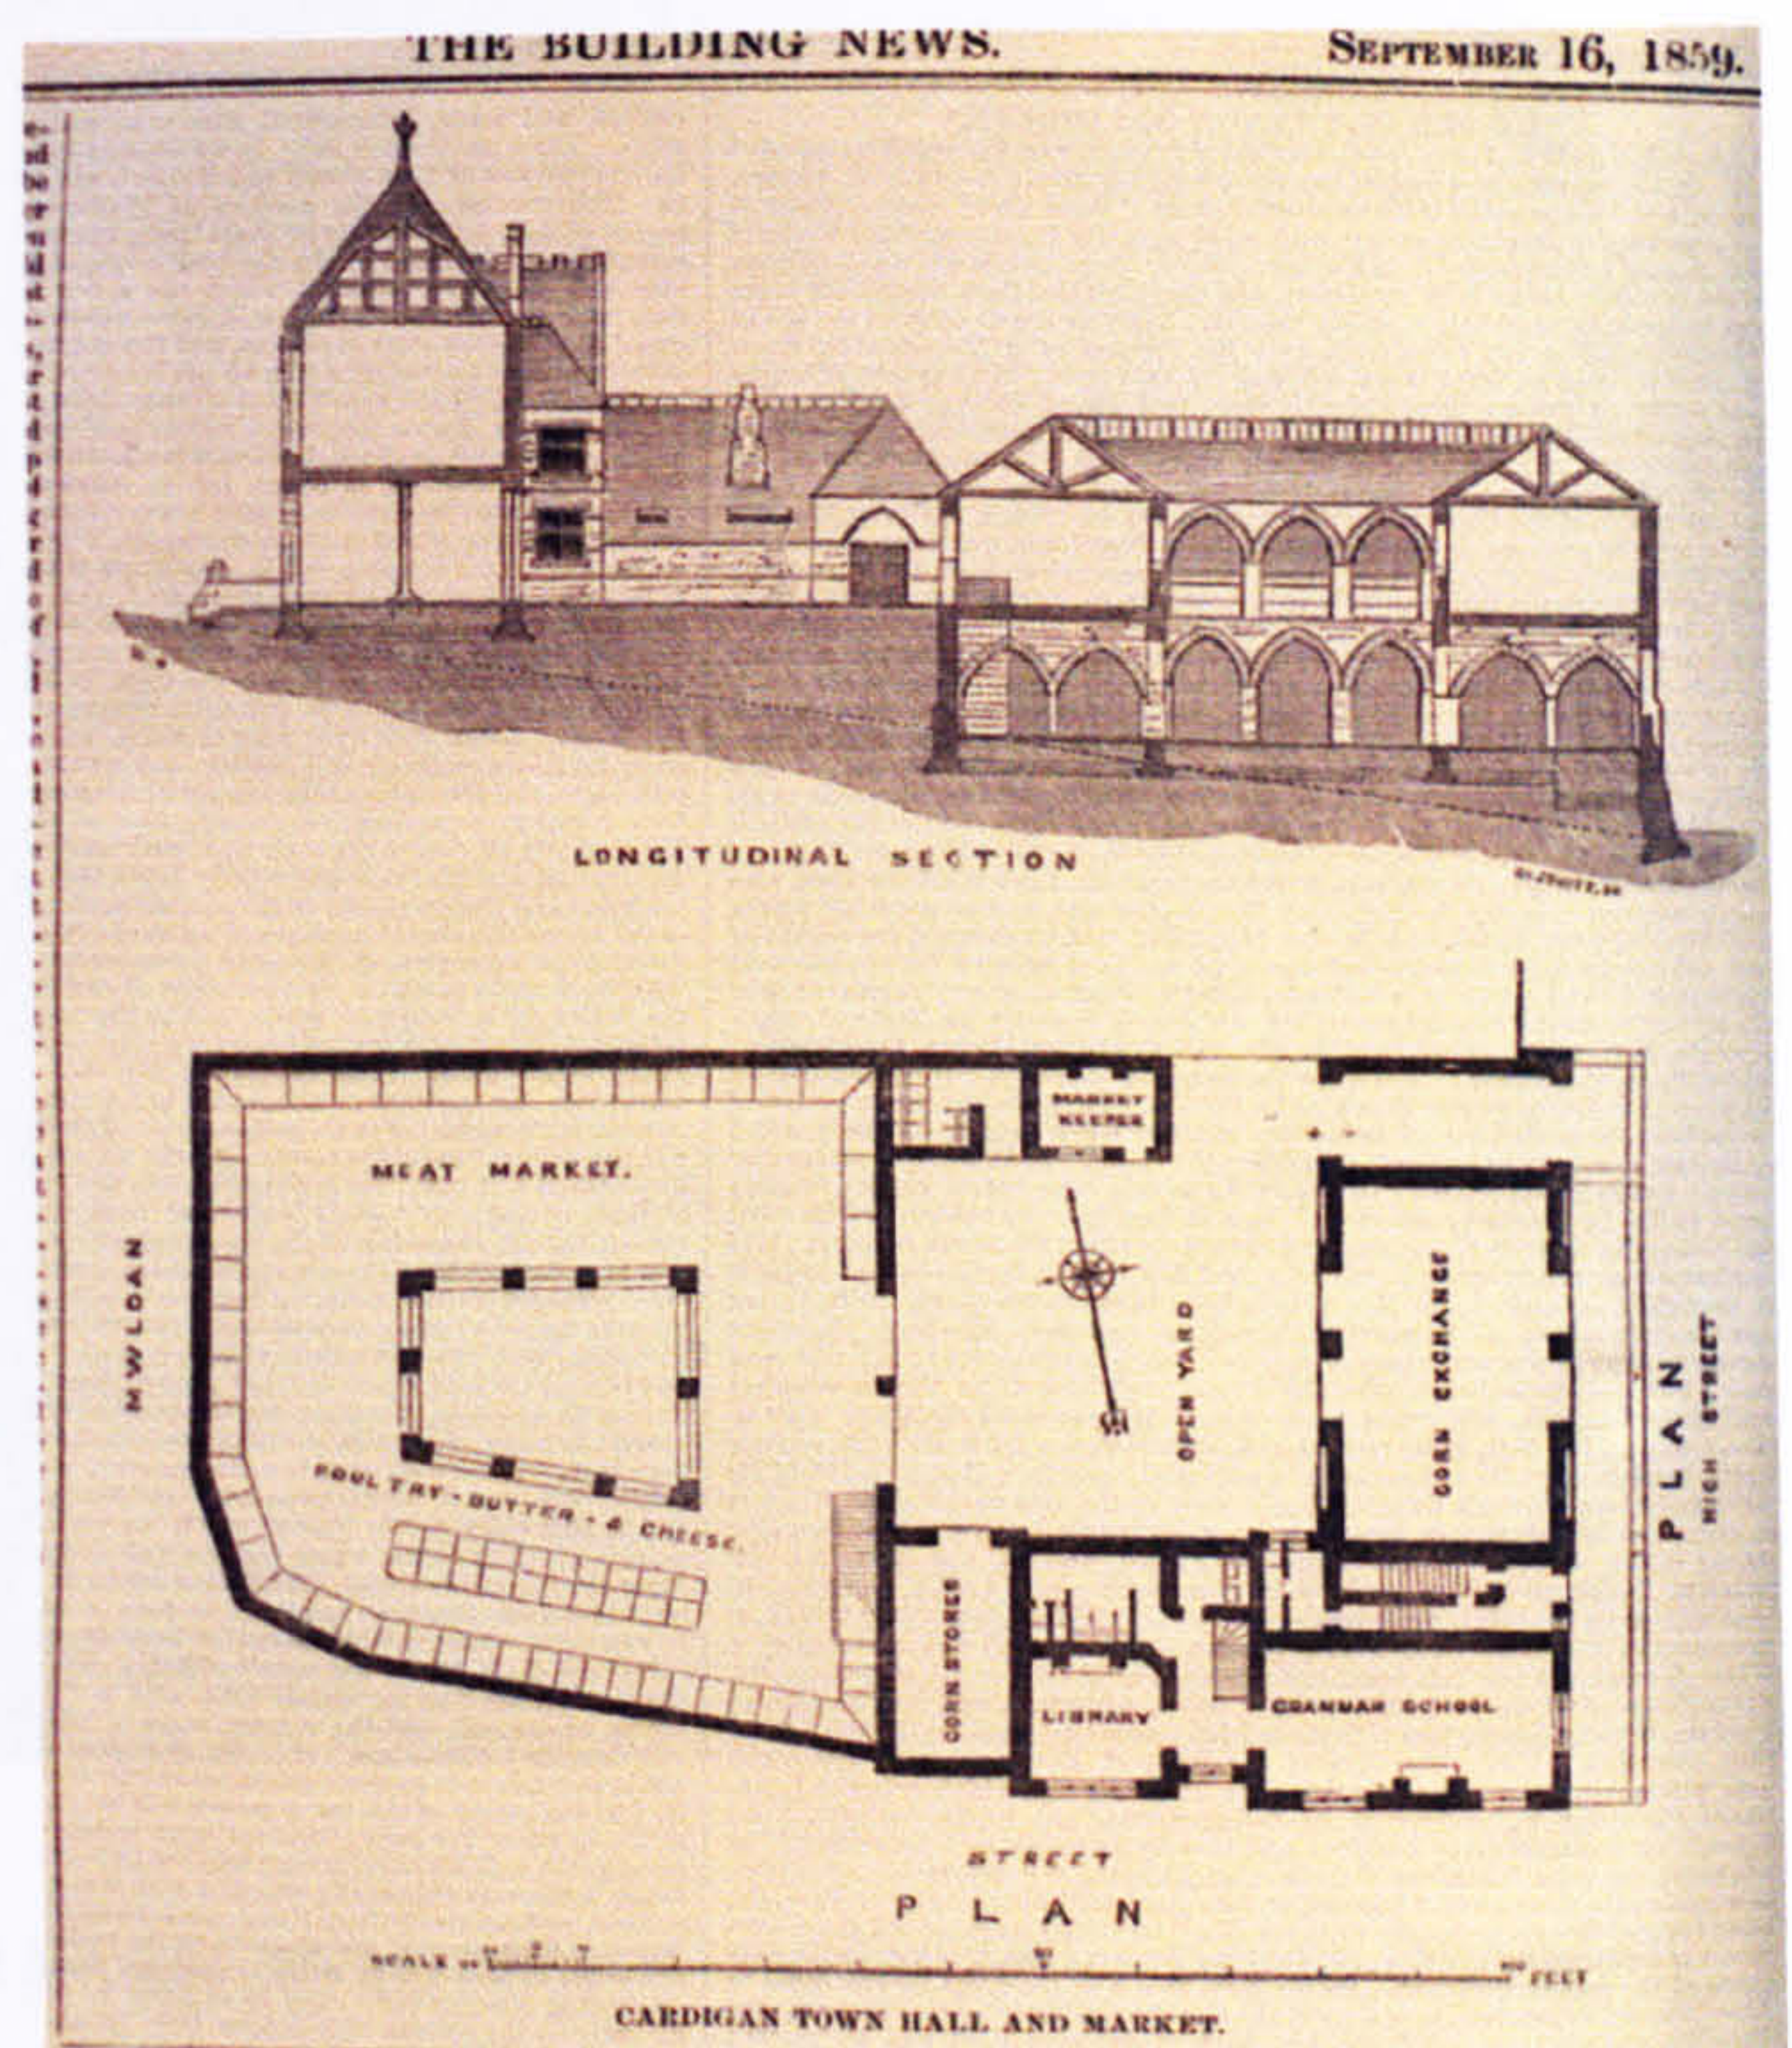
Cardigan Town Hall and Market: published section and plan (*The Building News*)
